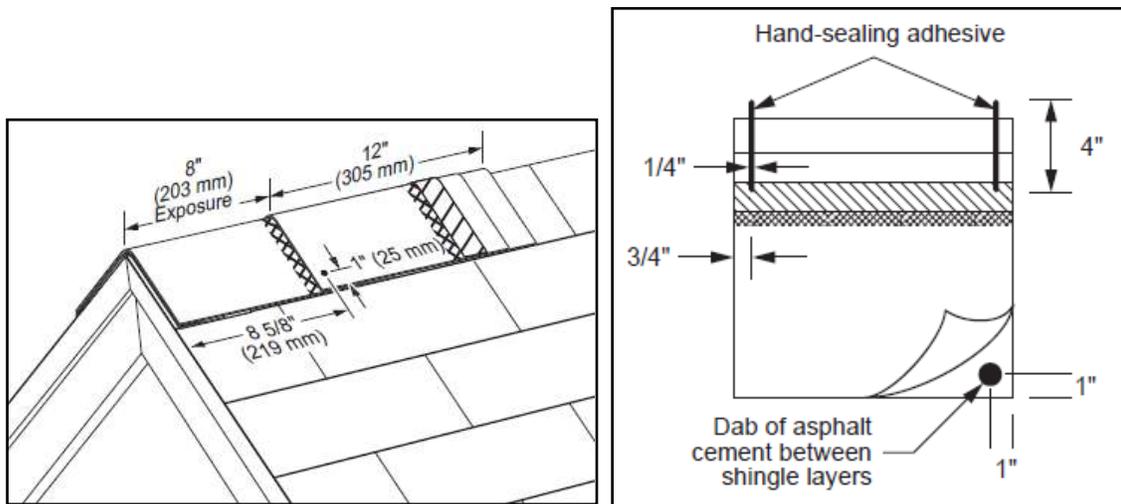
Use six nails and four spots of asphalt roofing cement on steep slopes.
